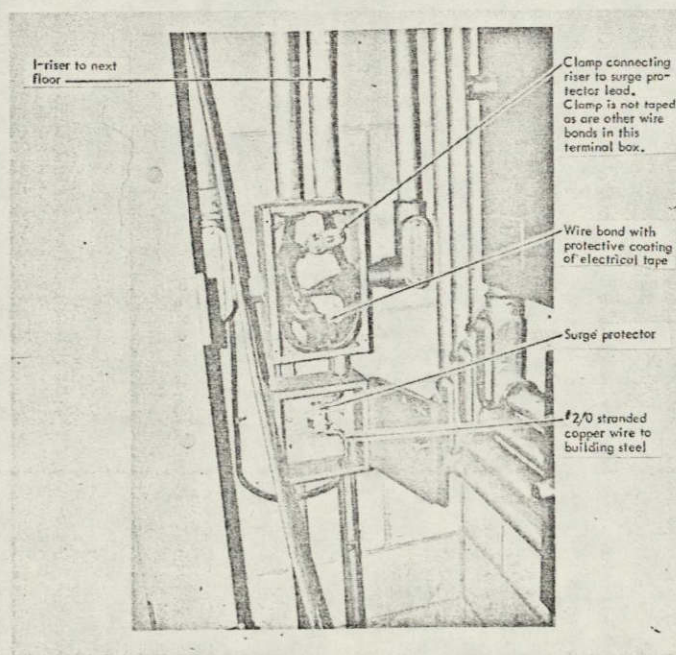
VAB, Tower E, Room 1E3 - I-Ground Riser Connections.
